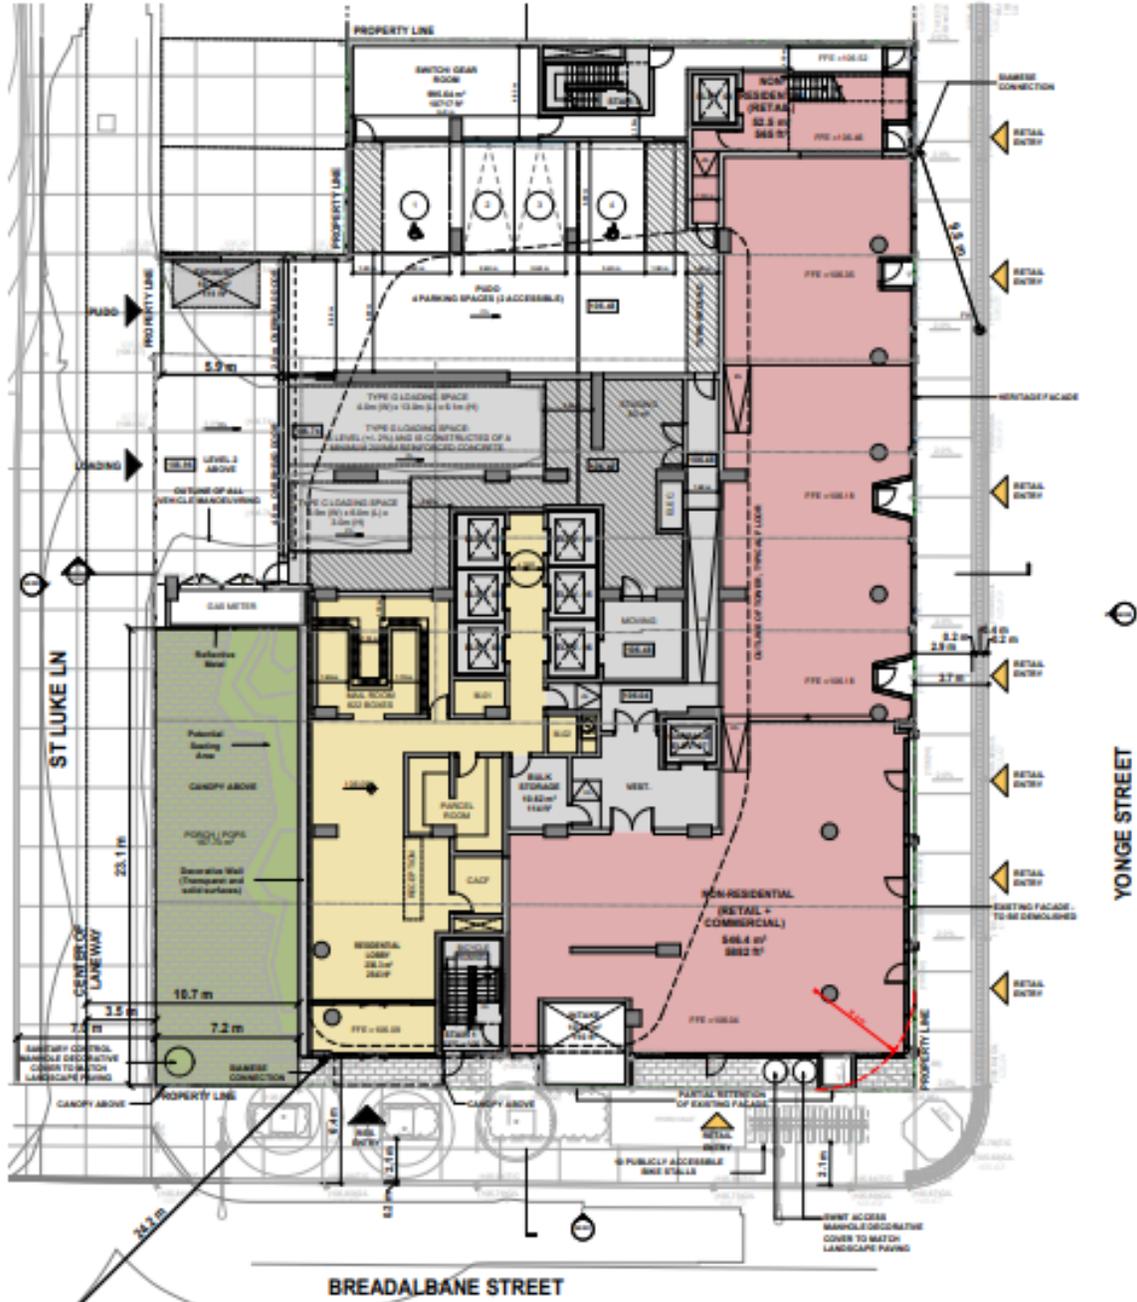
Proposed ground floor showing retail/commercial space, residential lobby off Breadalbane and publicly accessible open space at the southwest corner of the Site. (GPA, 2025)
